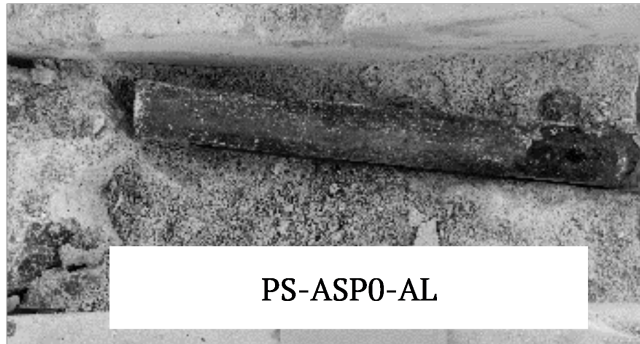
Visual inspection of reinforcing steel corrosion
